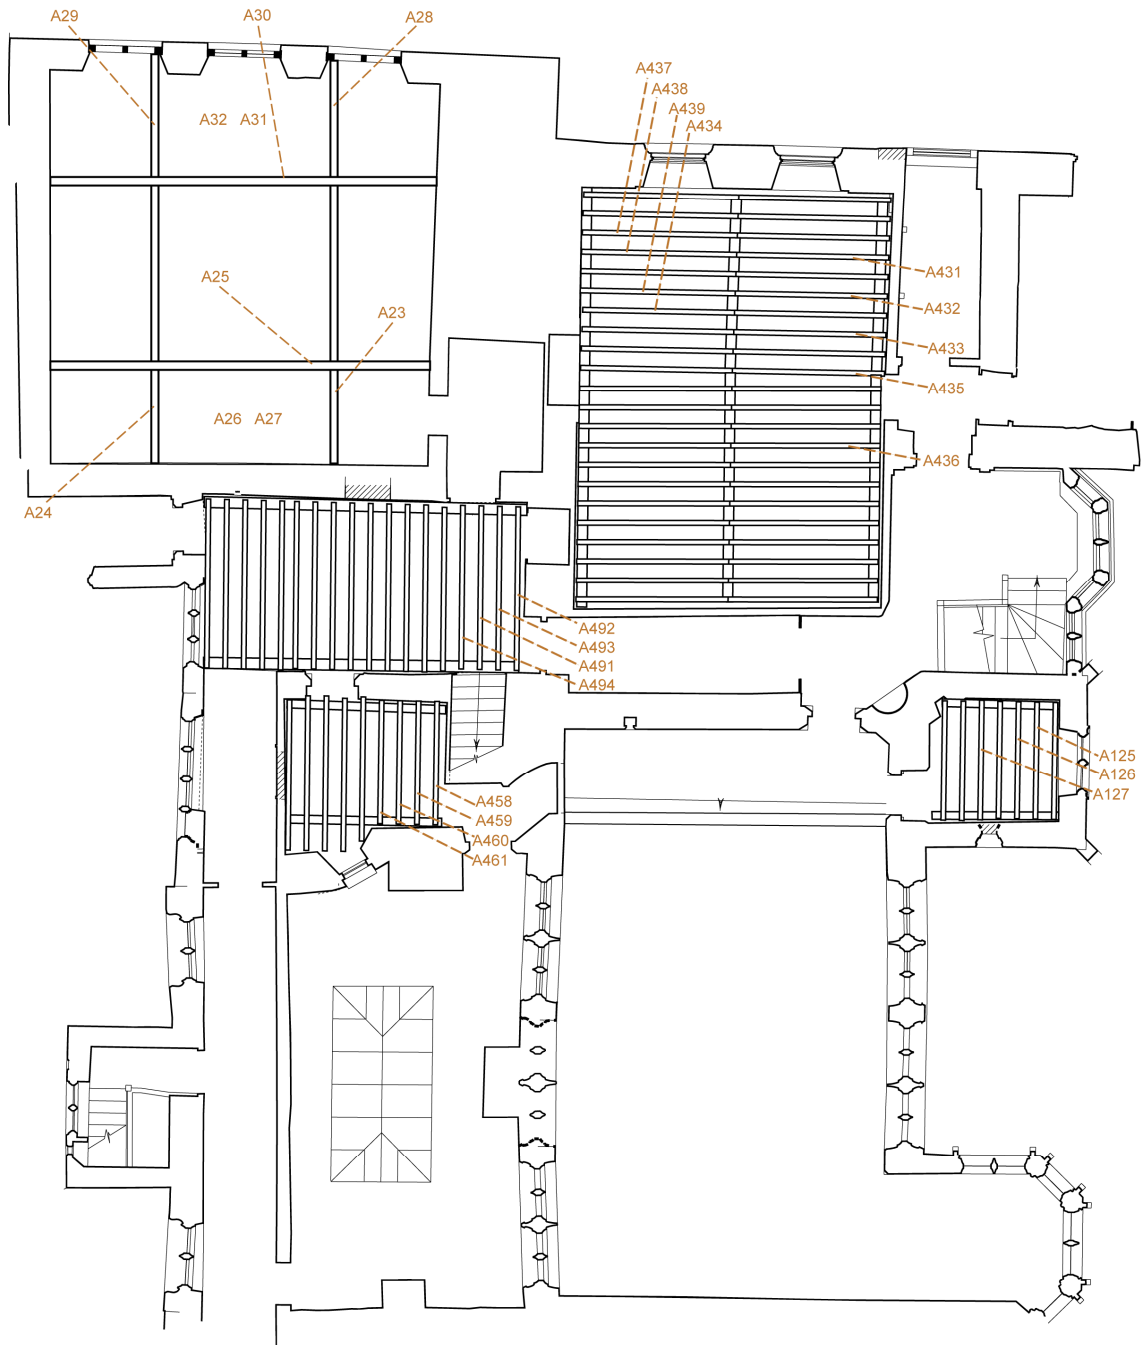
Floor timbers, second-floor rooms at the northern end of the Hall range, showing the locations of samples APT-A23–32, A125–7, A431–9, A458–61, and A491–4
